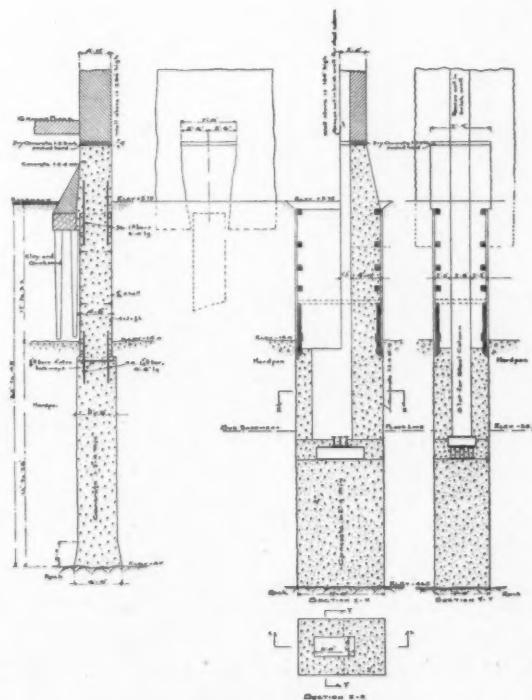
Underpinning cylinders and piers under east wall of the Beaver Street wing of the Welles Building
